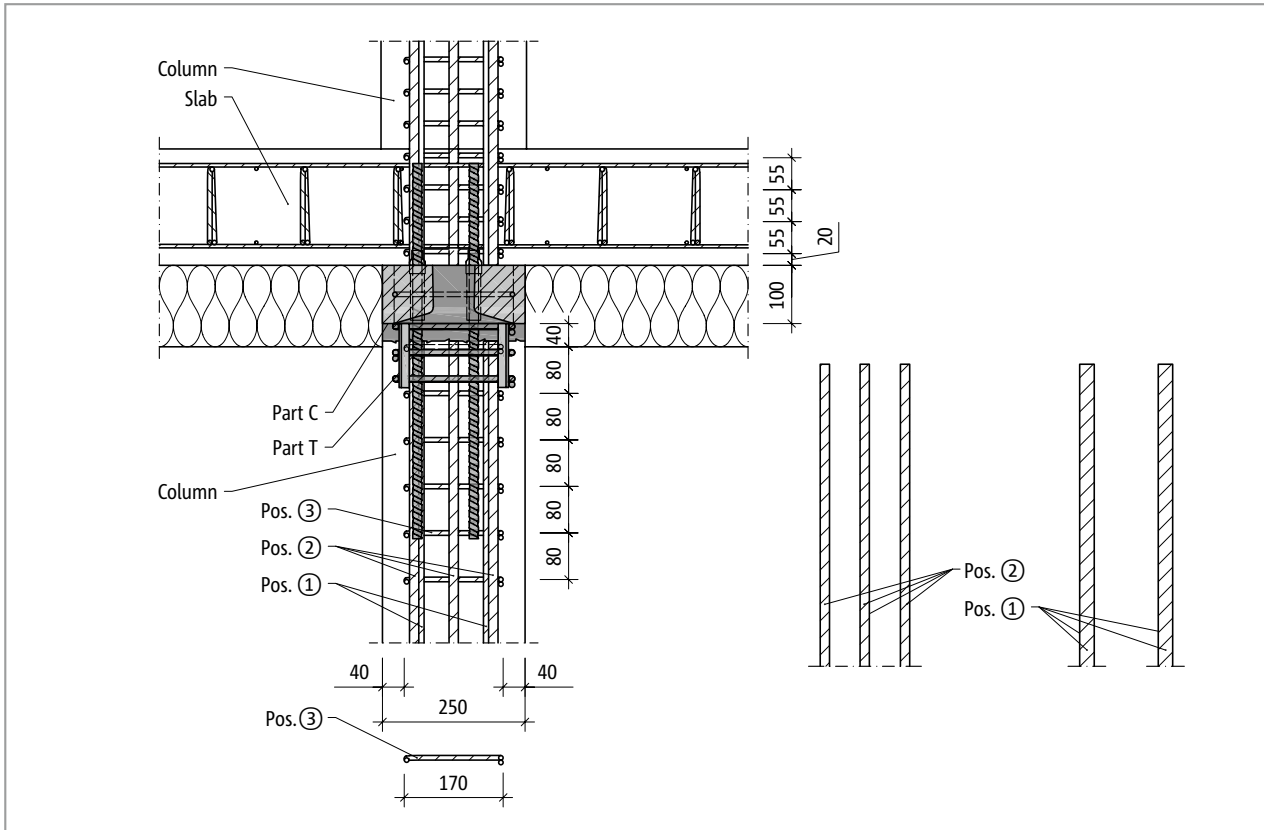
Schöck Sconnex® type P: On-site reinforcement in column cross-section A-A
